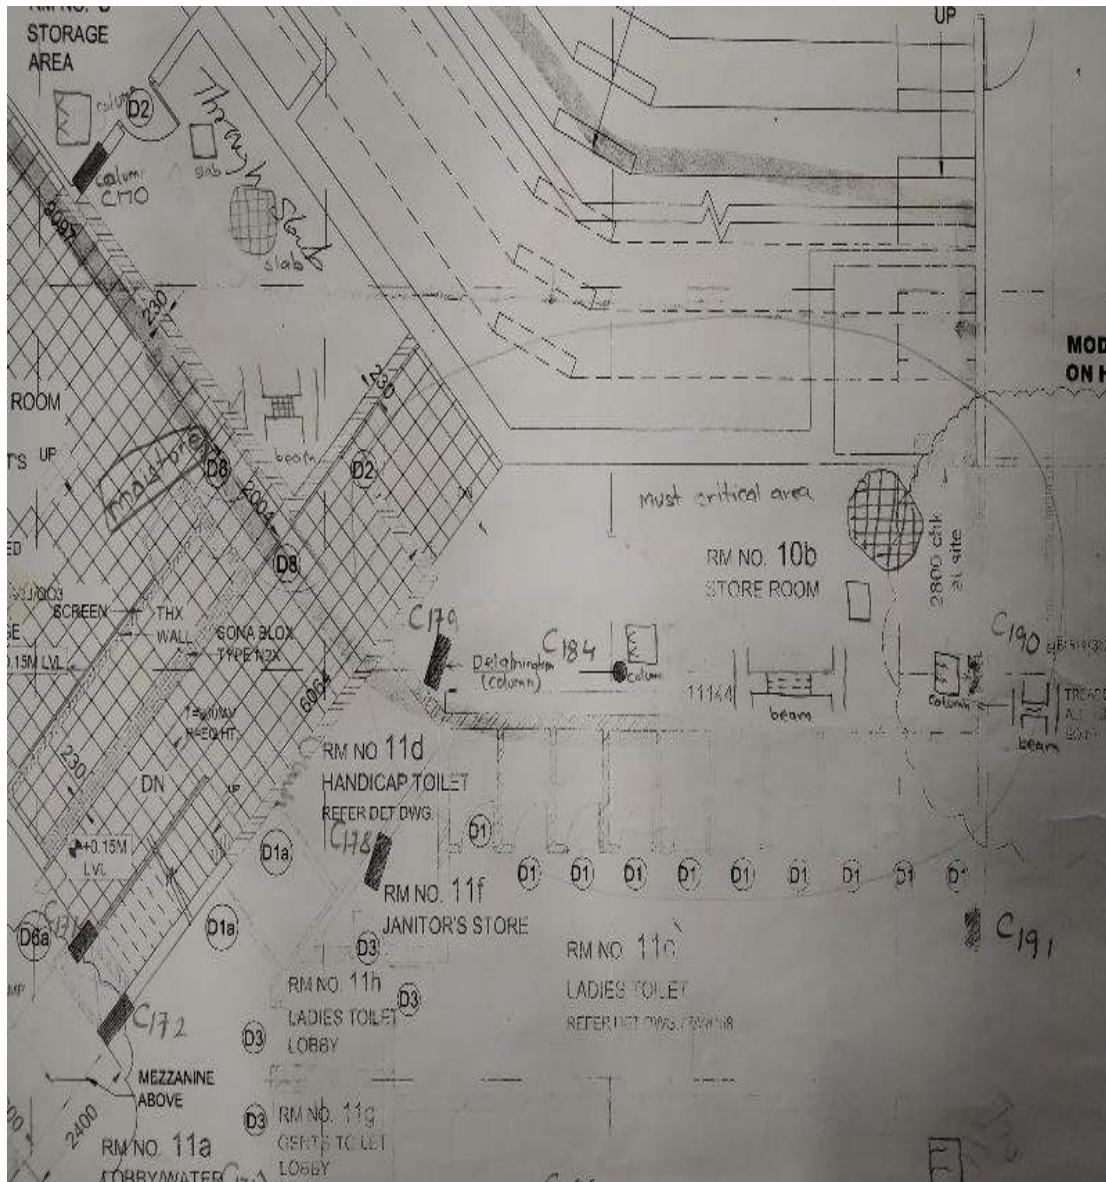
Storeroom (10b) located at ground floor near toilet block
